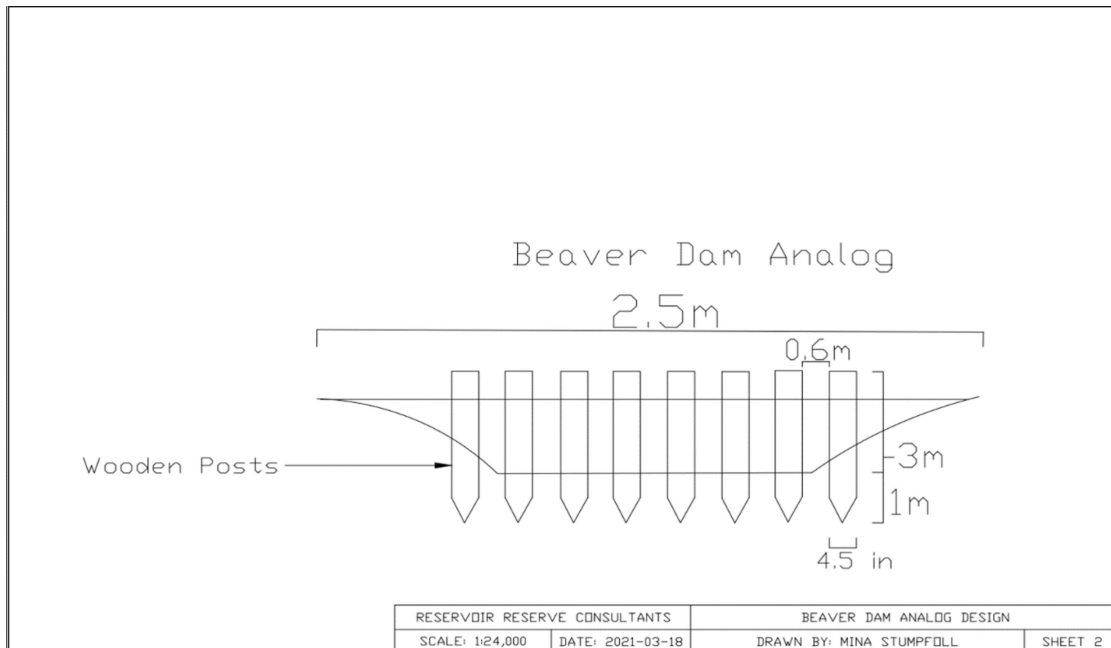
AutoCAD drawing of proposed Beaver Dam Analog structure.
